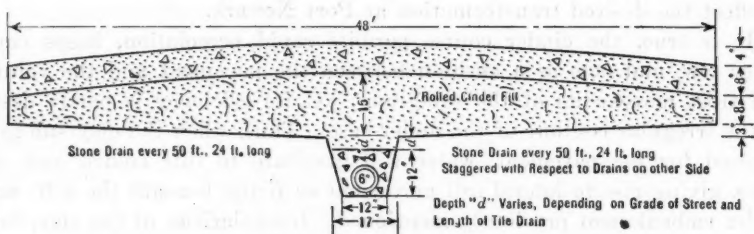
CROSS-SECTION OF 48-FOOT CONCRETE PAVEMENT.
